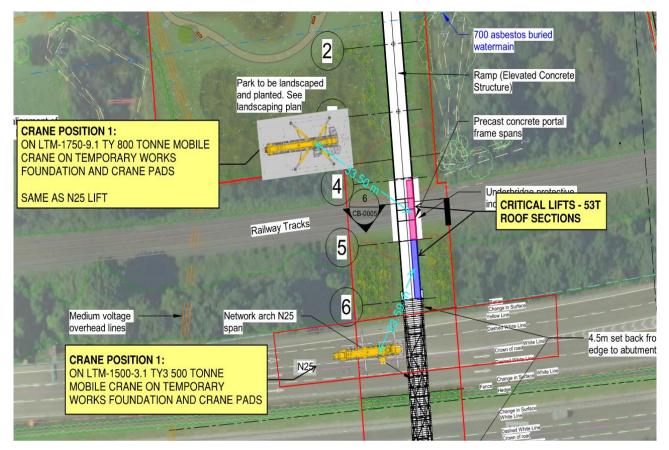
Proposed methodology for erection of precast portal frame elements of railway spans
